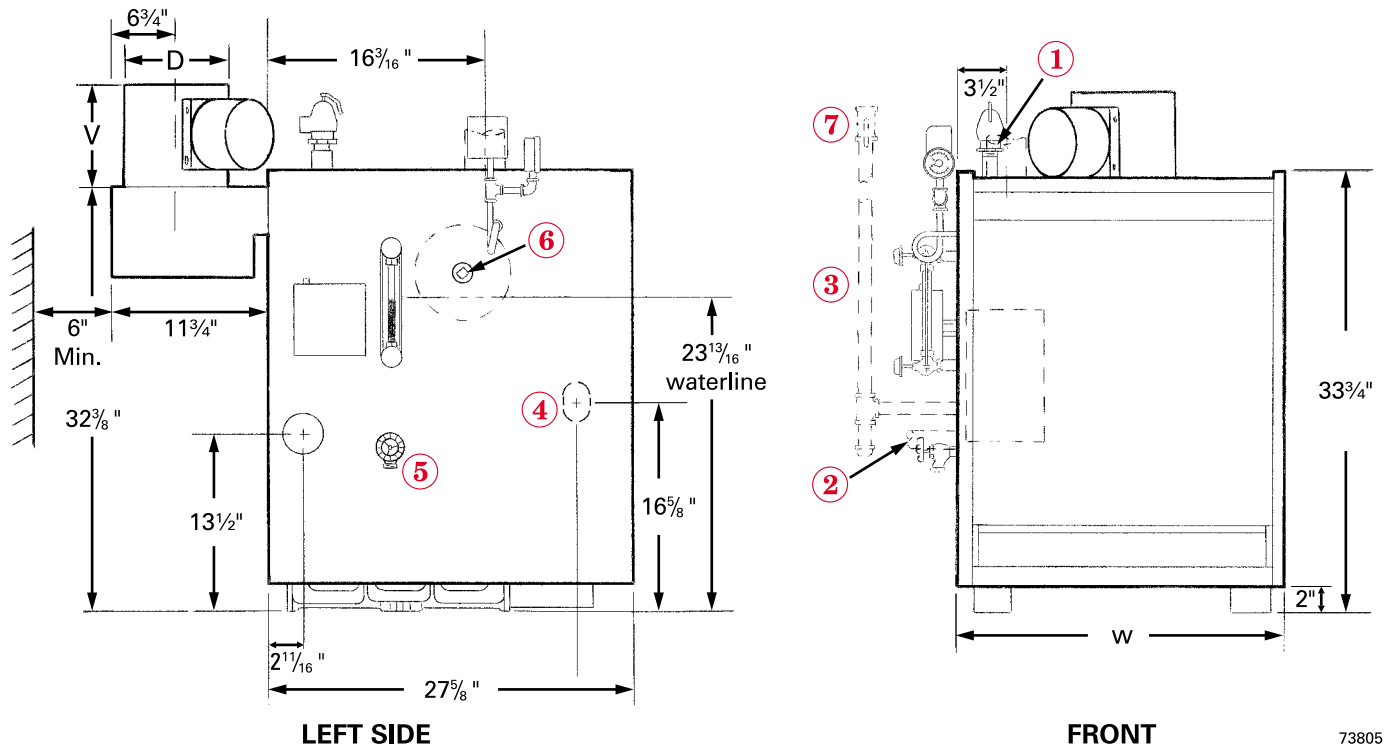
Dimensional drawing — ALL DIMENSIONS IN INCHES
